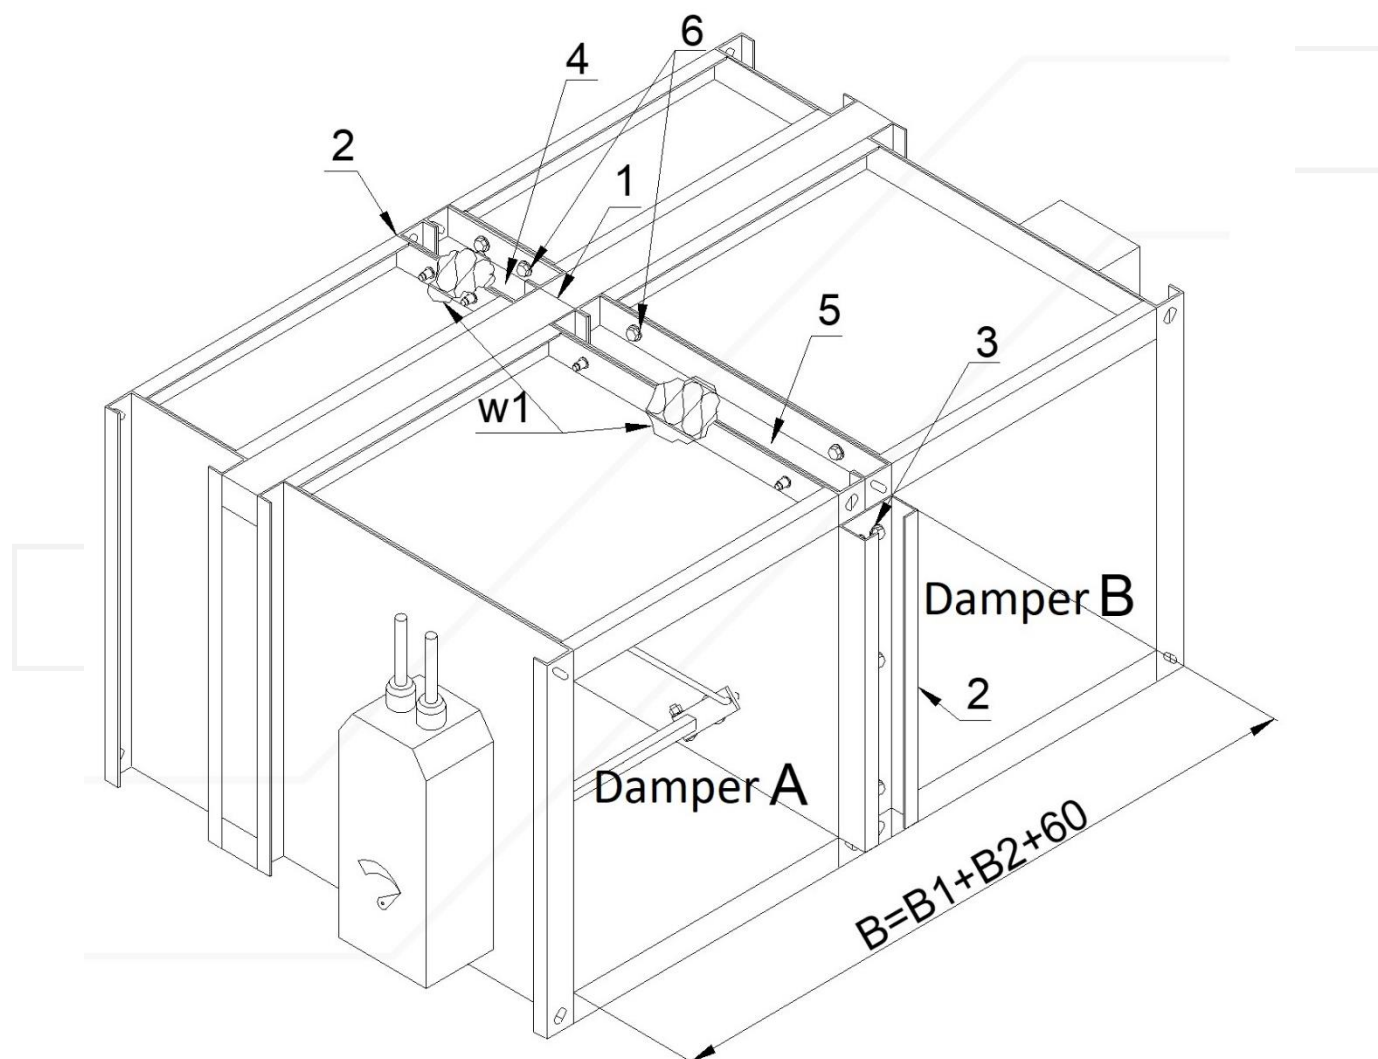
Arrangement 3 – horizontal battery consisting of two fire dampers KWP
